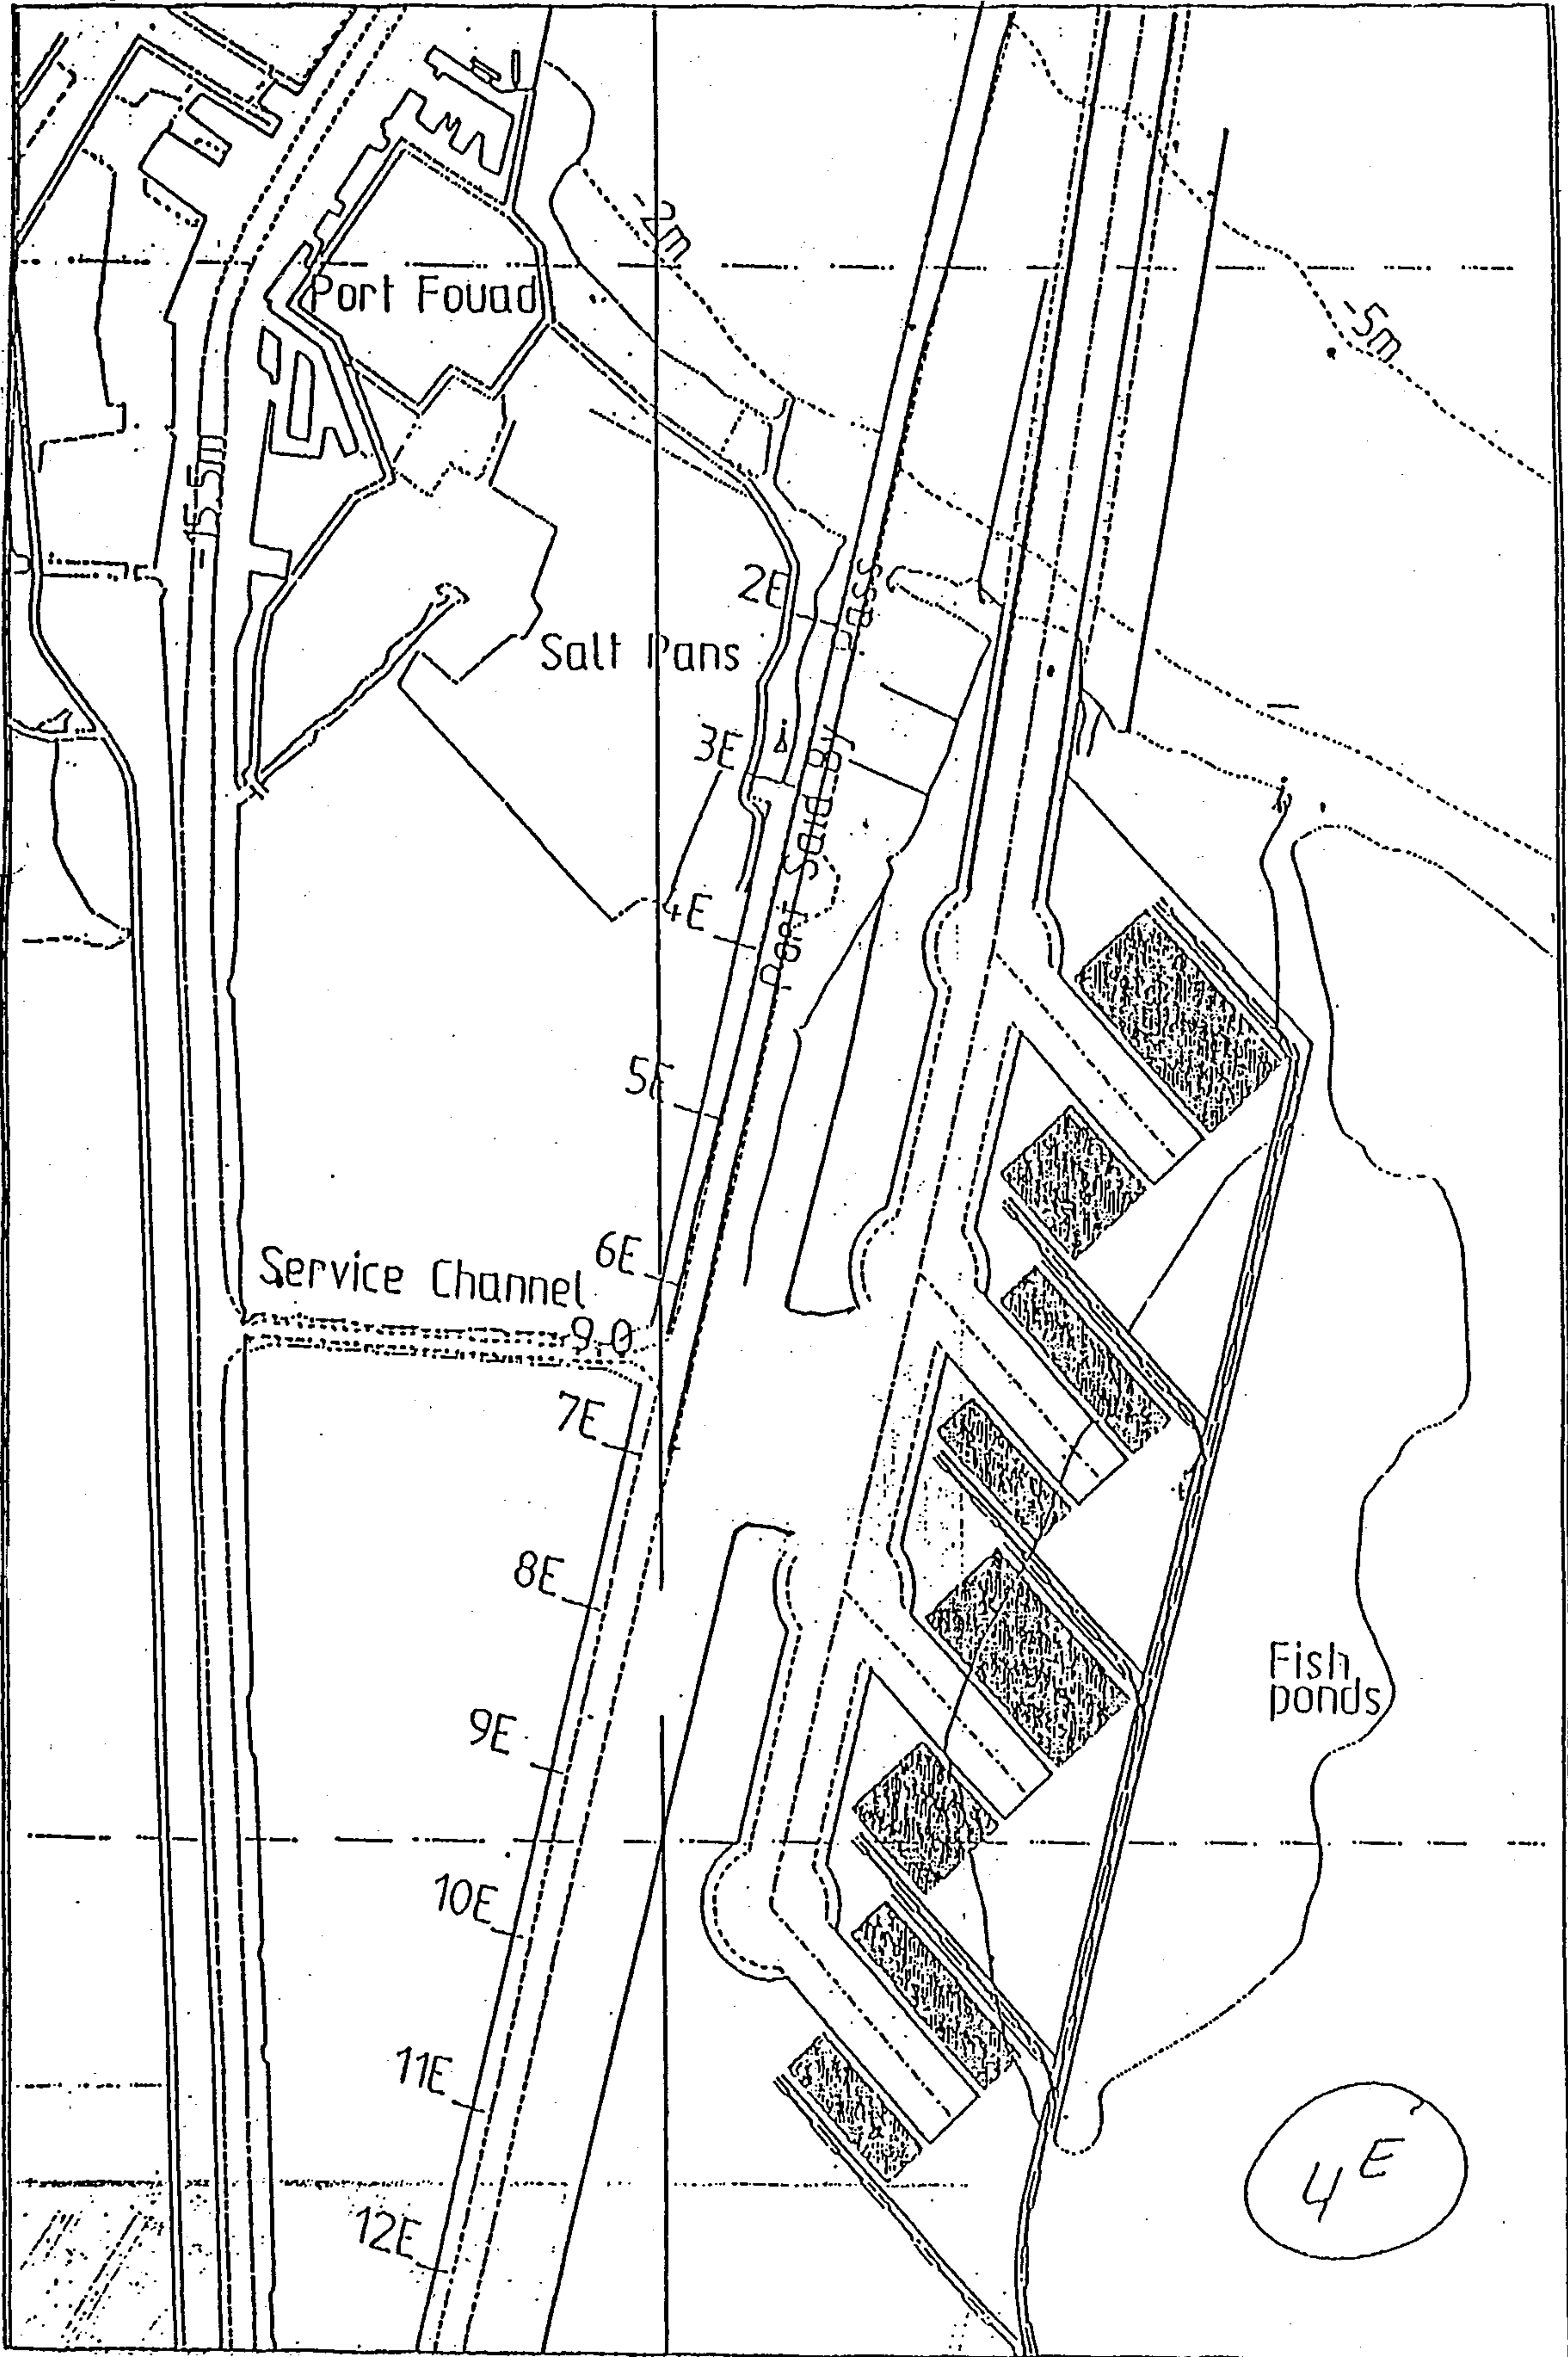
Alternative Layout Plan of the Port Said East Port Project (2)
